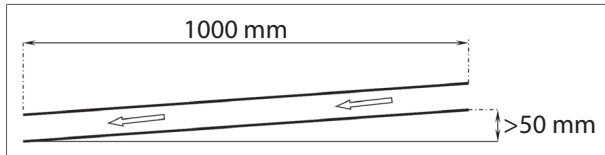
Minimum slope of horizontal piping of 50 mm/m (3°)
